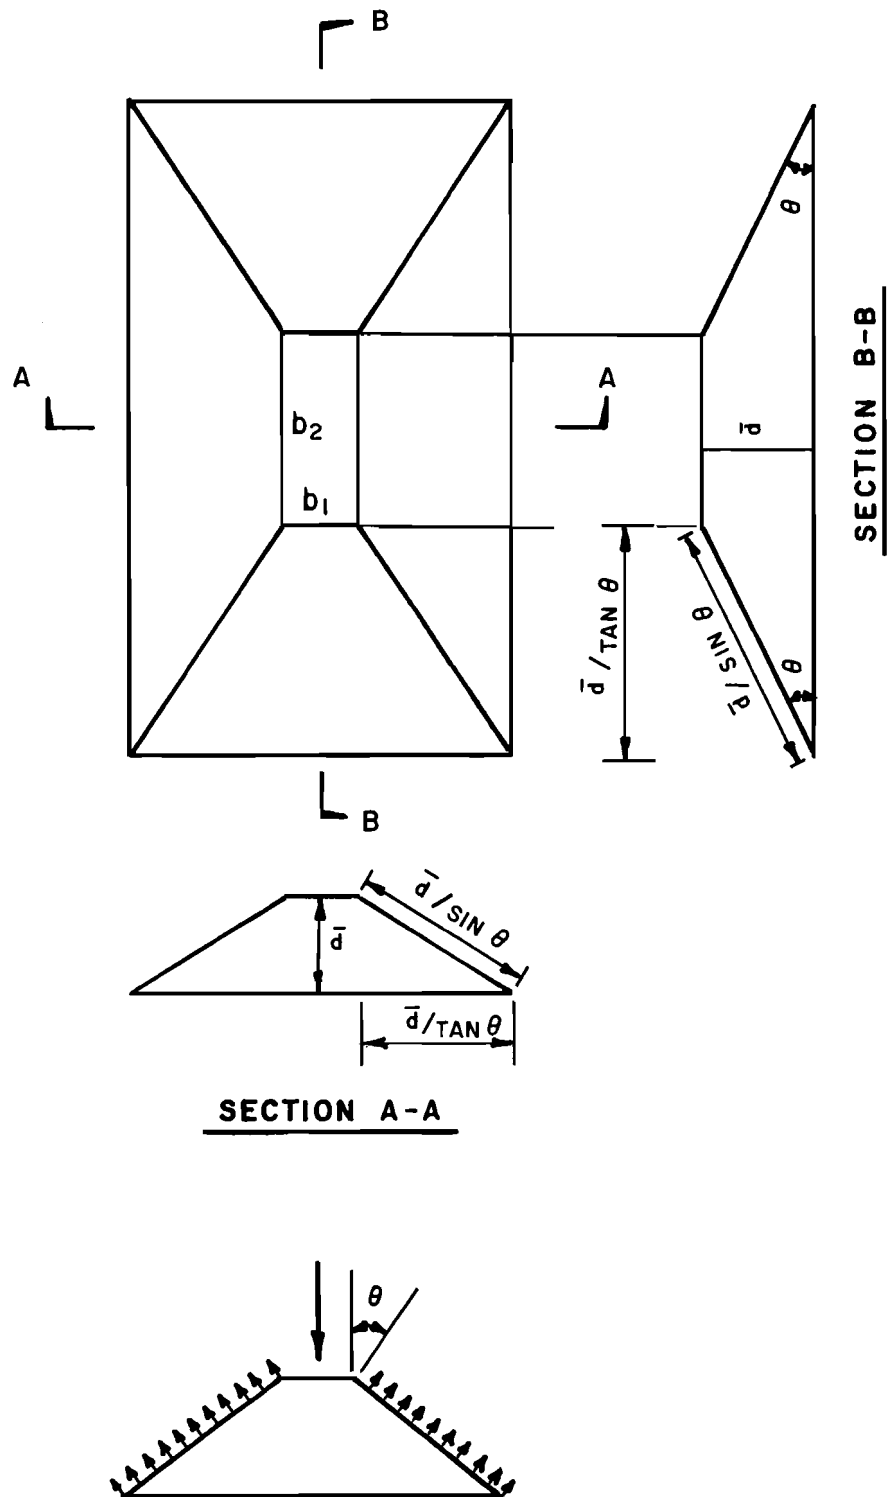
Plan and sectional views of failure surface, general punching shear model.
